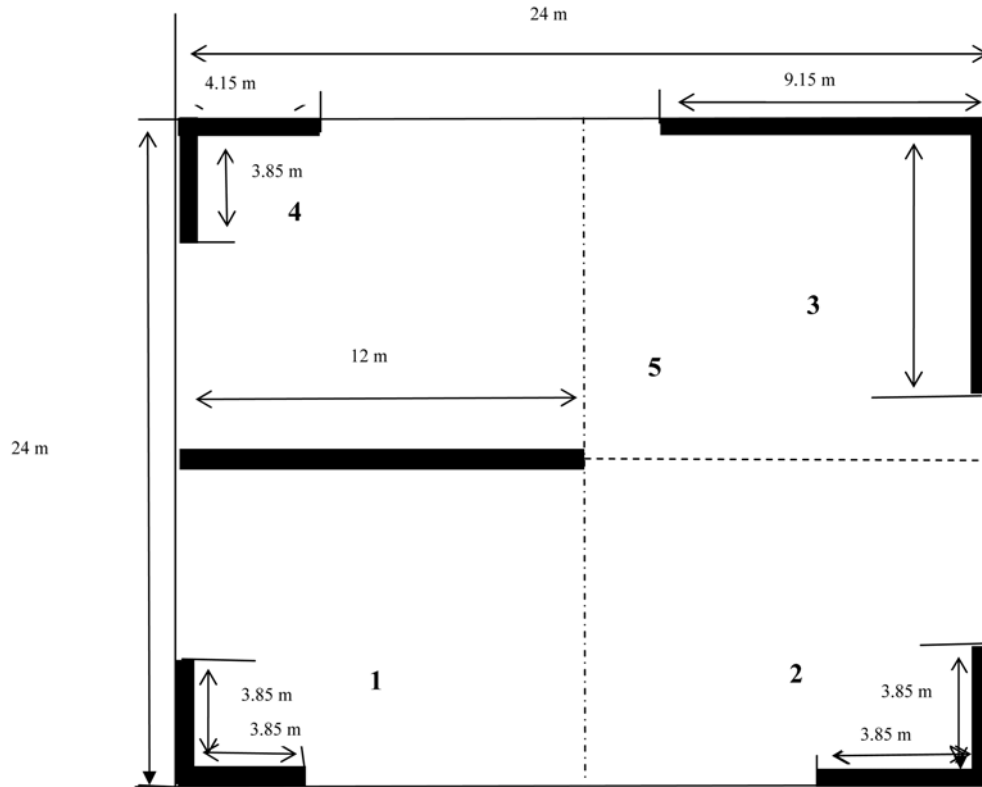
A typical asymmetric building braced by shear-walls and angle type thin- walled open section structure (Meftah and Tounsi 2008)
